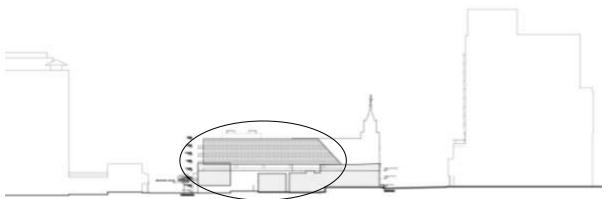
Church courtyard elevation of the proposal shown in relation to its surroundings
